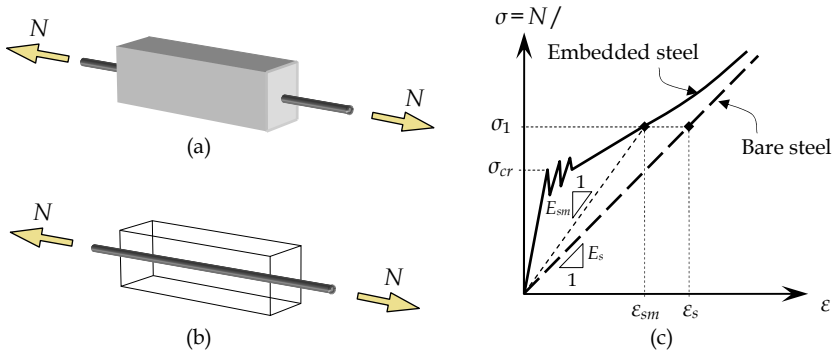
Concrete tension stiffening: (a) tension chord with embedded reinforcing steel; (b) bare reinforcing bar; (c) comparison of stiffness of embedded steel and bare steel bar according to Wu, (2010) and Lárússon et al. (2012)
